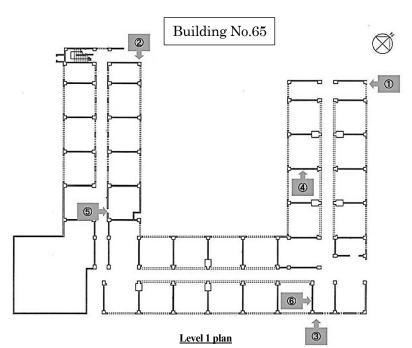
Locations of concrete core sampling at Building No.65
